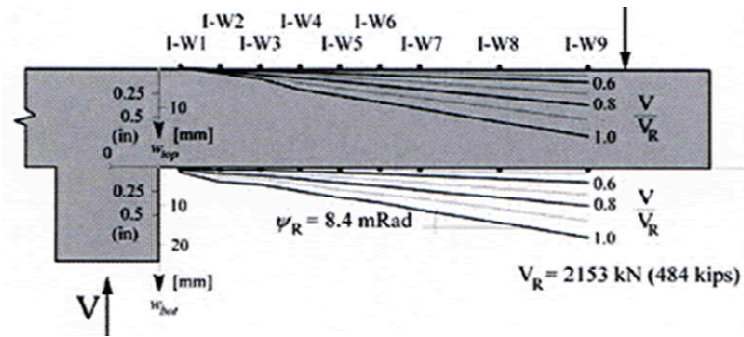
Deflection of slab-column connection (Guandalini, Burdet, & Muttoni, 2009)
